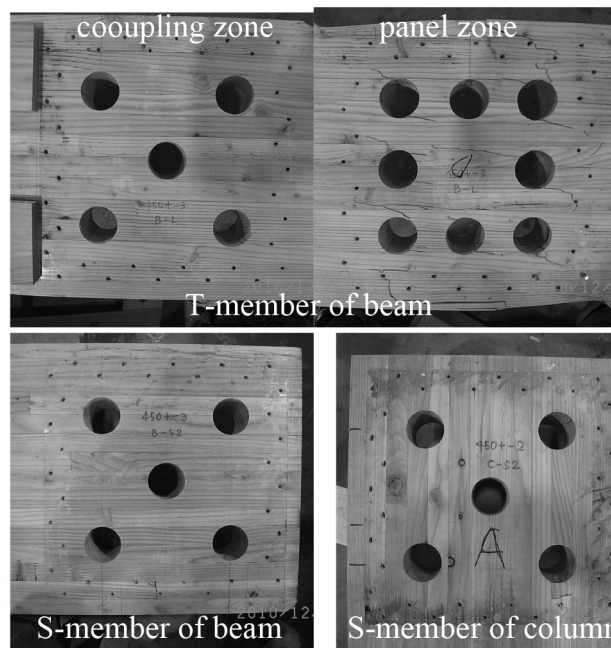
T-member and S-member of beam and S-member of column after test
